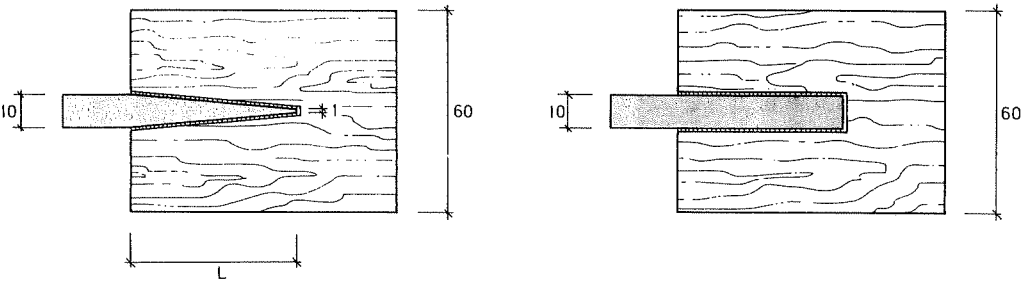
Geometry of steel-to-wood specimens. a) Tapered joint. b) straight joint.
